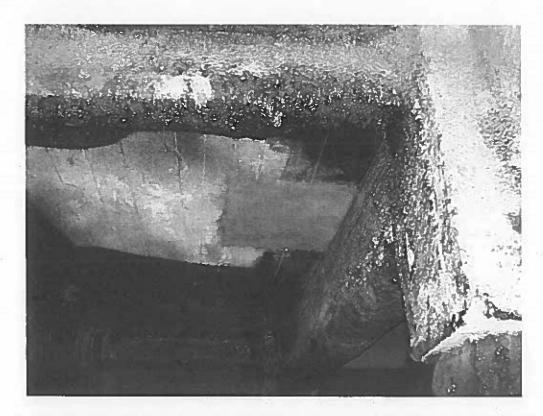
Typical Slab Patch Repair (5/14/2019)
